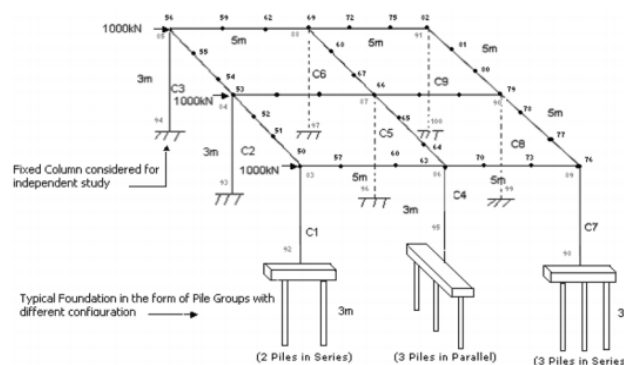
TYPICAL BUILDING FRAME SUPPORTED BY GROUP OF PILES BASED ON RESEARCH BY CHORE ET AL. 2010
